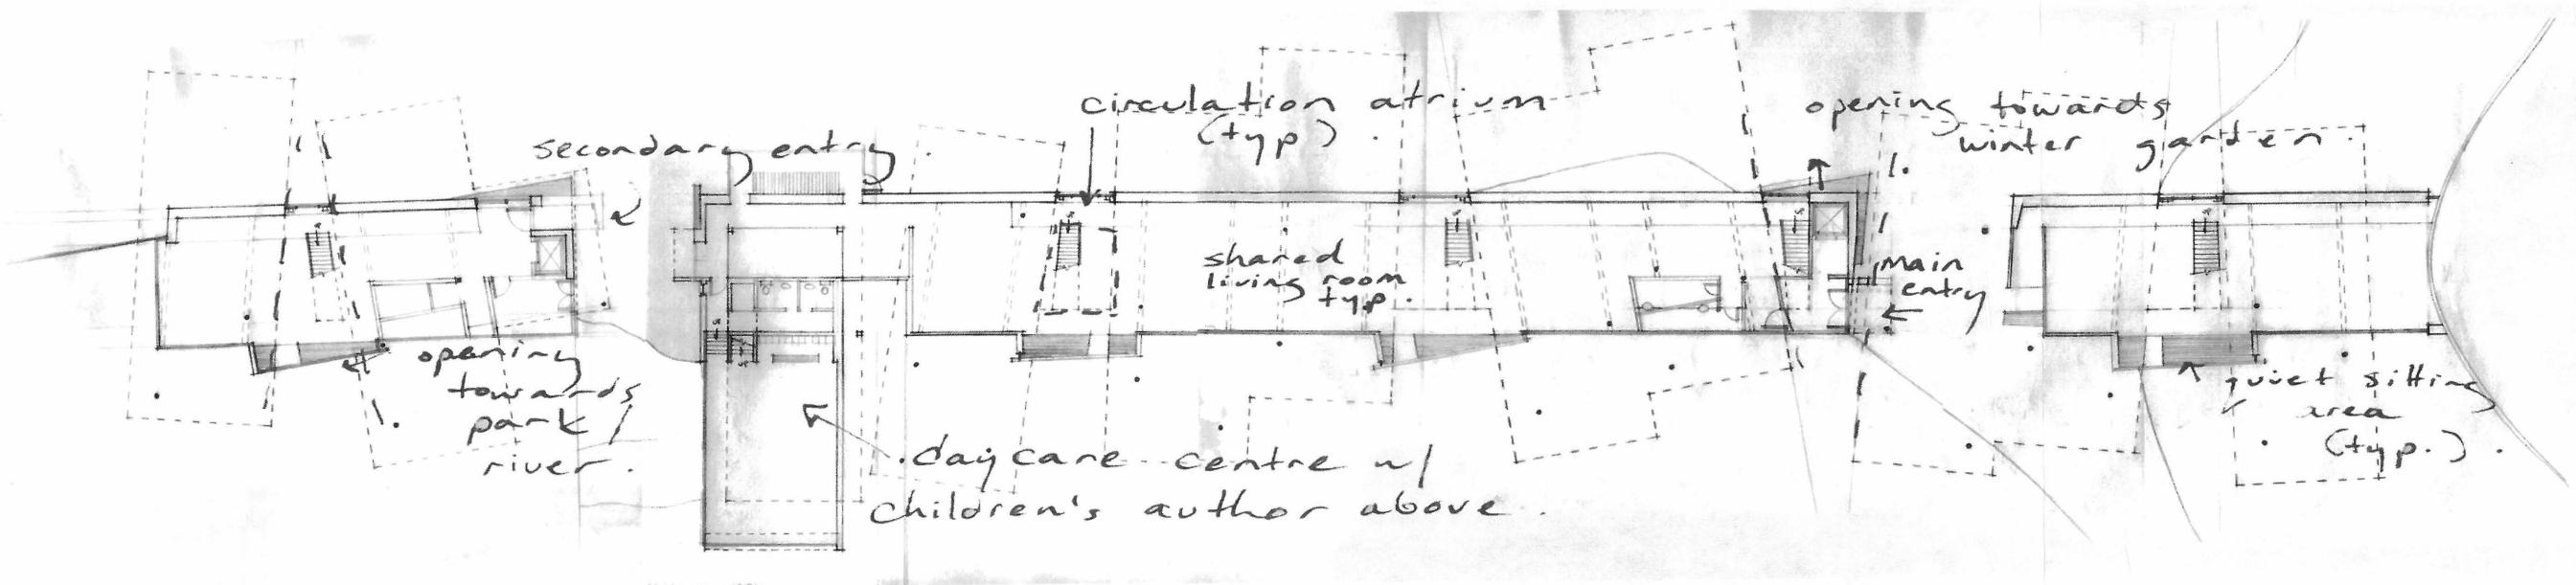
Ground Floor Plan, graphite drawing, 2006, created by author.
